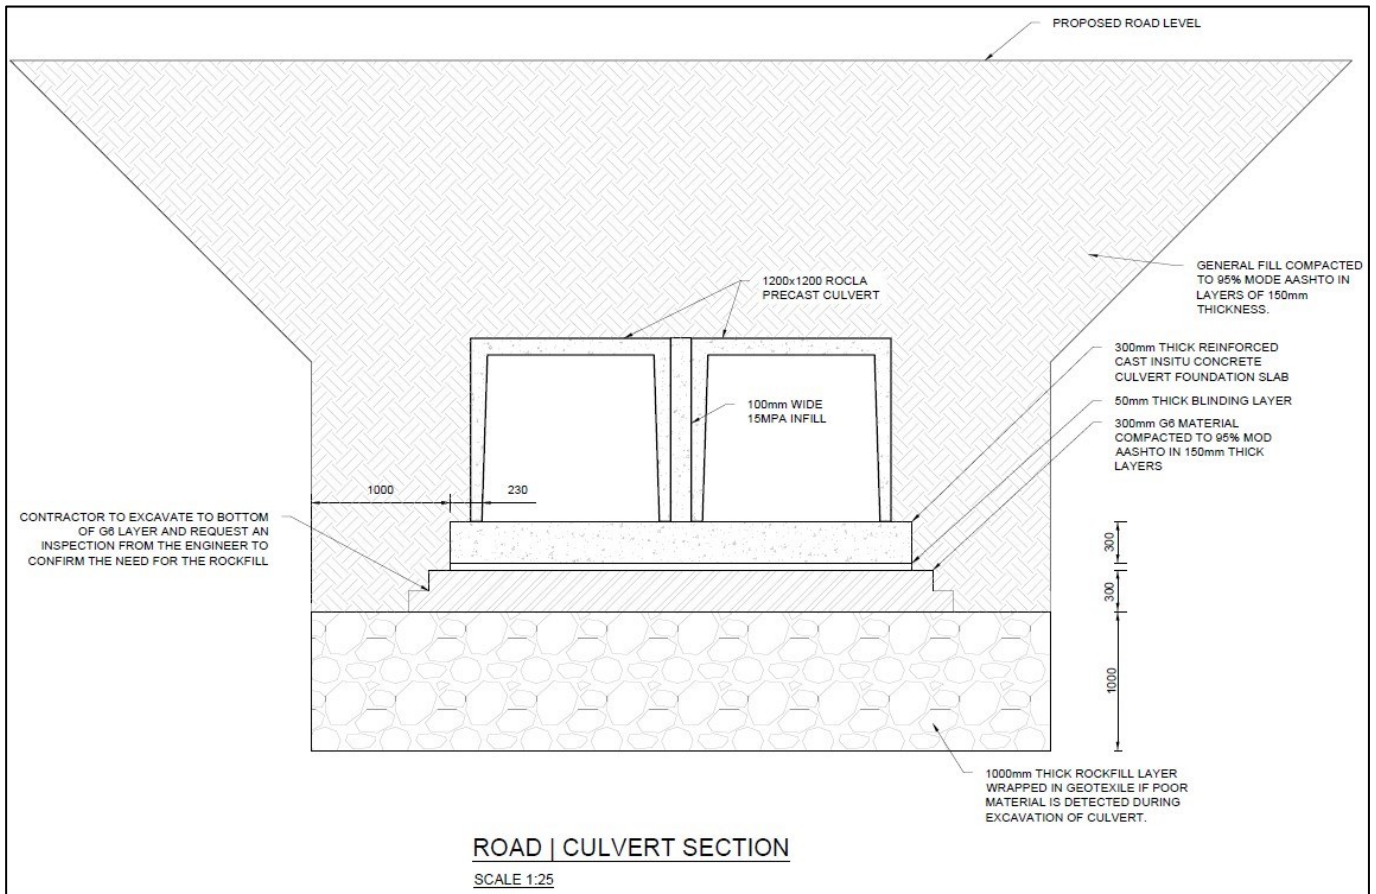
Overview of the Culvert Proposed at WC1, Including Erosion Control Measures (Source: Struxit Projects, 2022).
